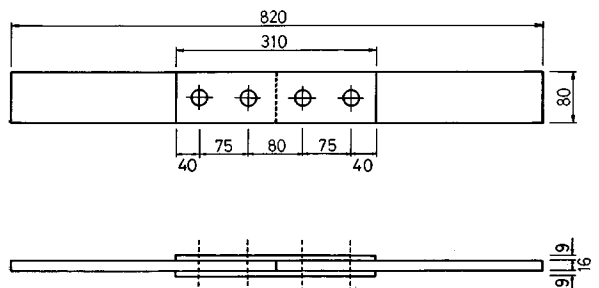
Geometry of bolted joint specimen for fatigue tests.
